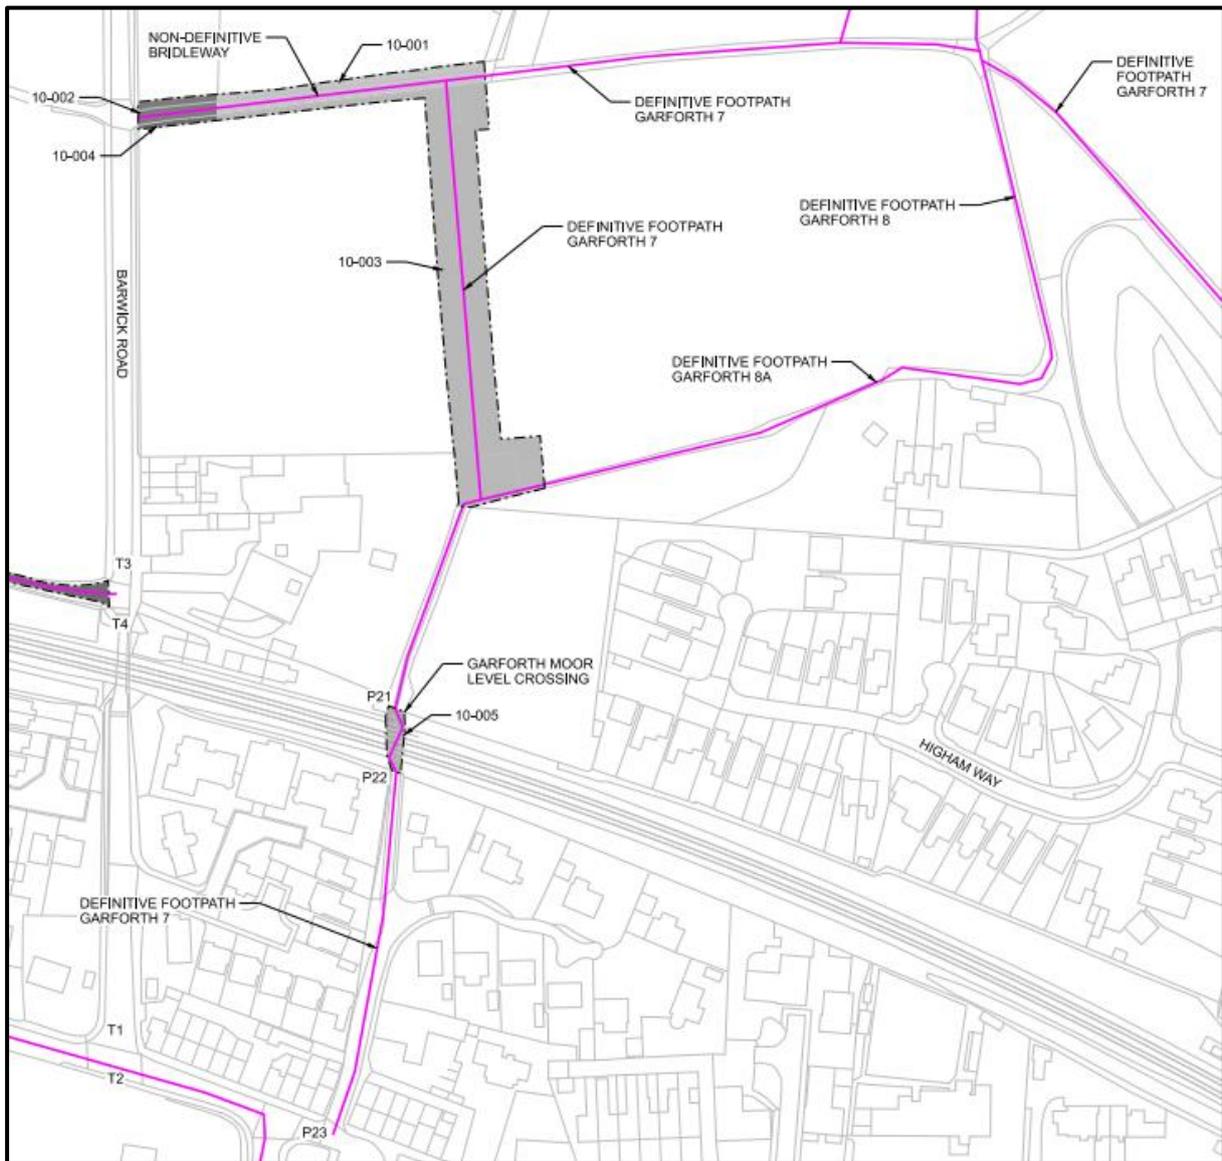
Extract of Works and Land Plan Order Sheet 7 (NR09)
